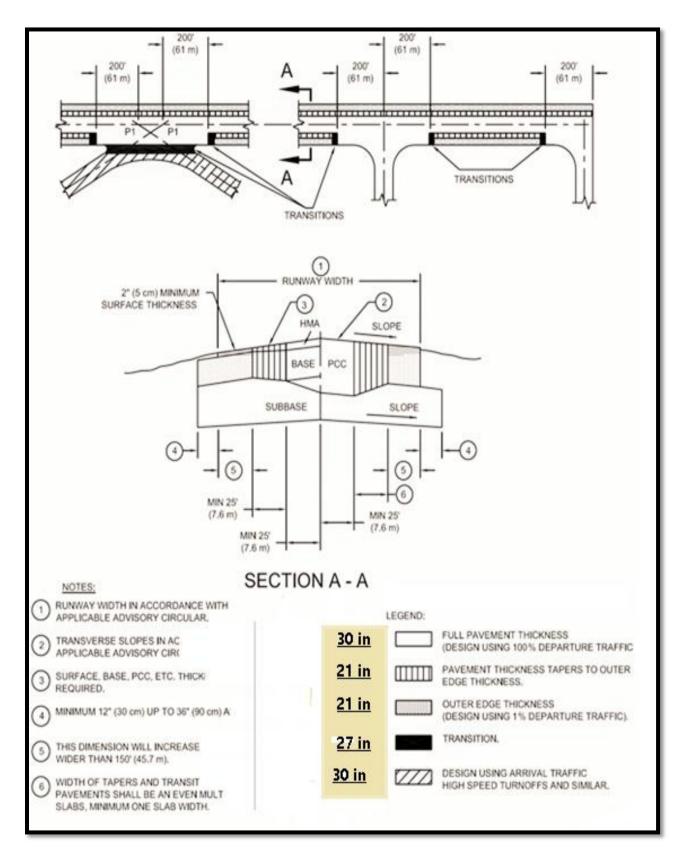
Typical Plan and Cross Section for KNIA Runway Pavement designed by AI (nomographs)
